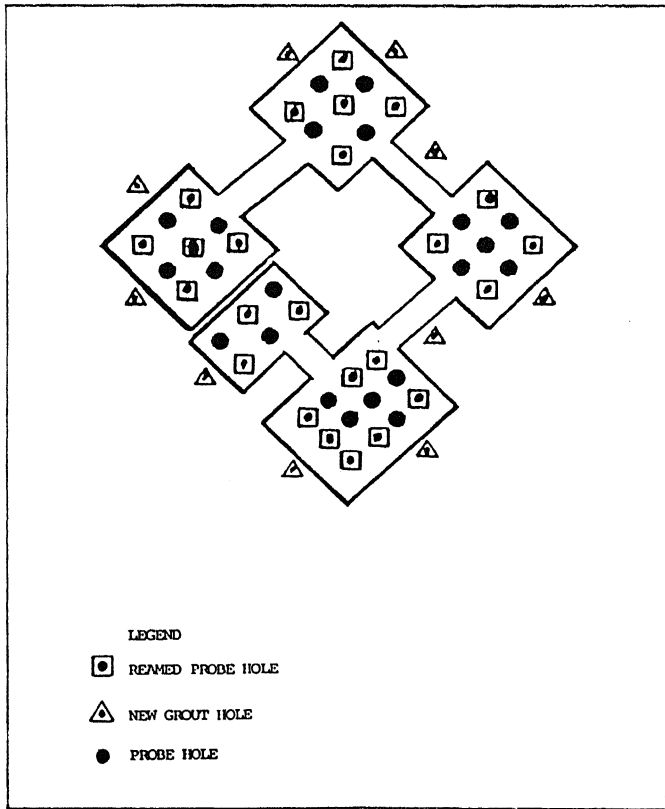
LAYOUT PLAN OF STRUCTURE
